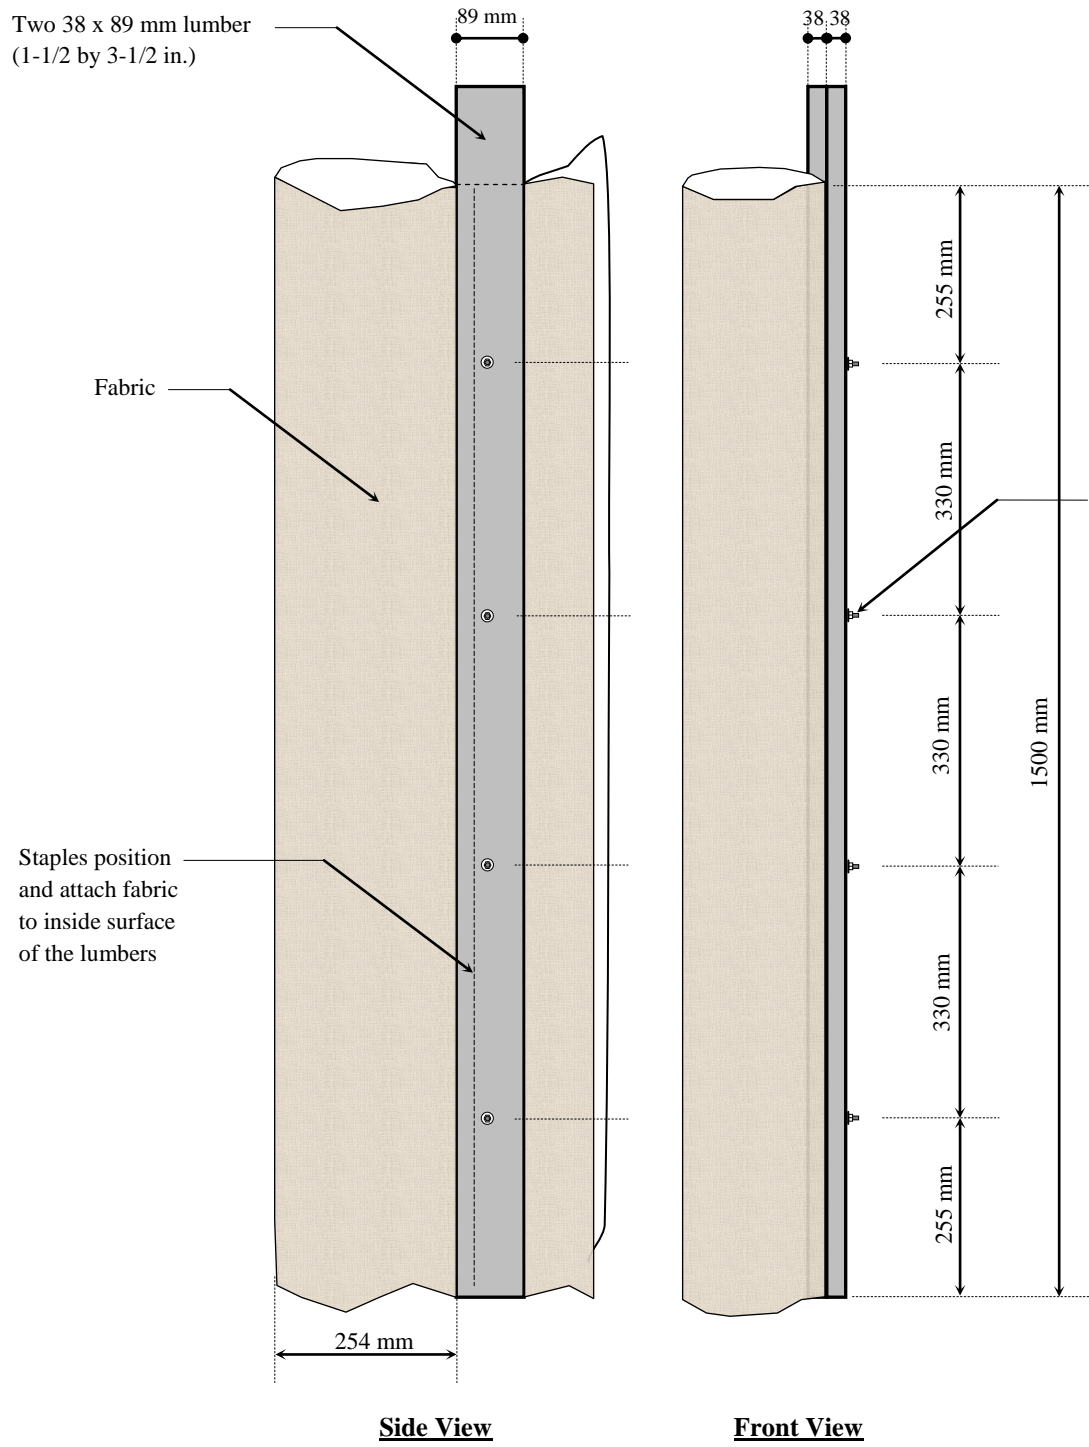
Configuration of the fabric formwork for reinforced concrete column
